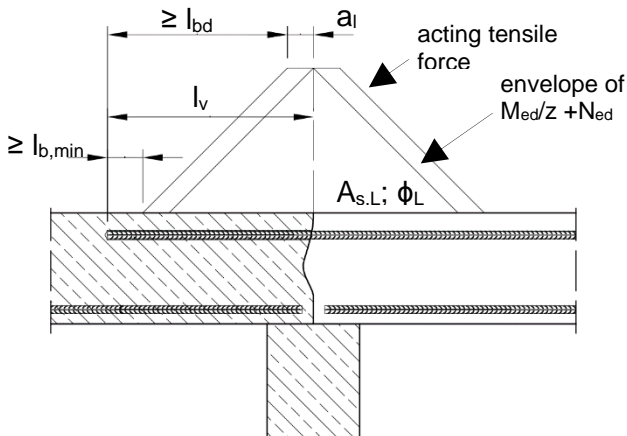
Overlapping joint for rebar connections of slabs and beams
